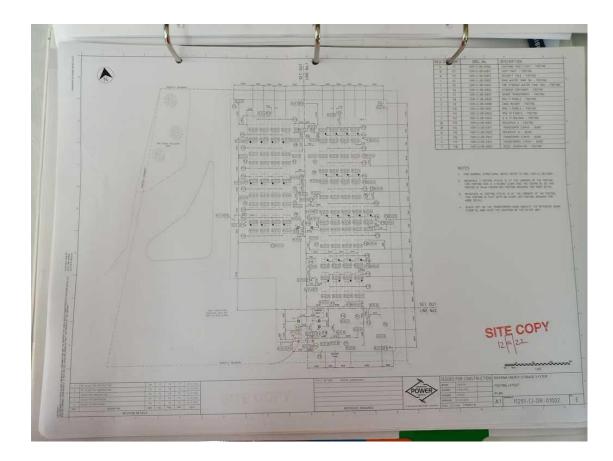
Approved Final Layout Plans (Civil Drawings) issued for construction kept in site folder
